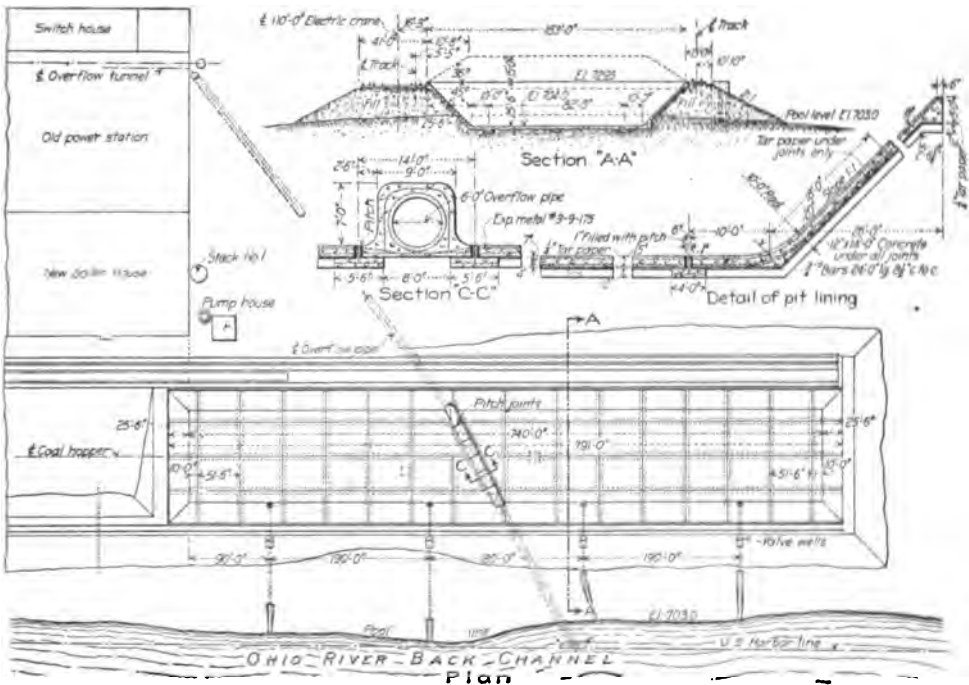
Plan and section of Duquesne Light Co.'s coal-storage pit at Pittsburgh.
